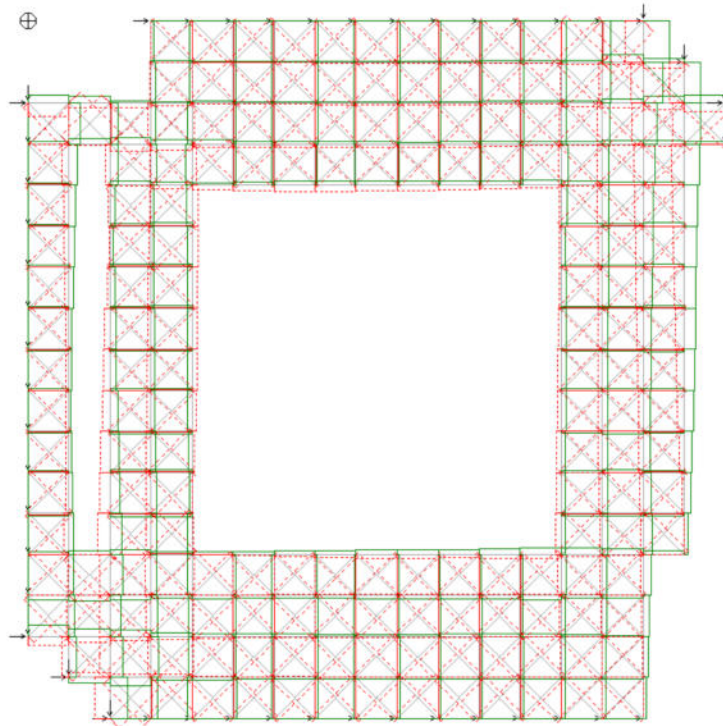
Analysis Model Loading - L07 (UB) Reinforced Concrete Floor
